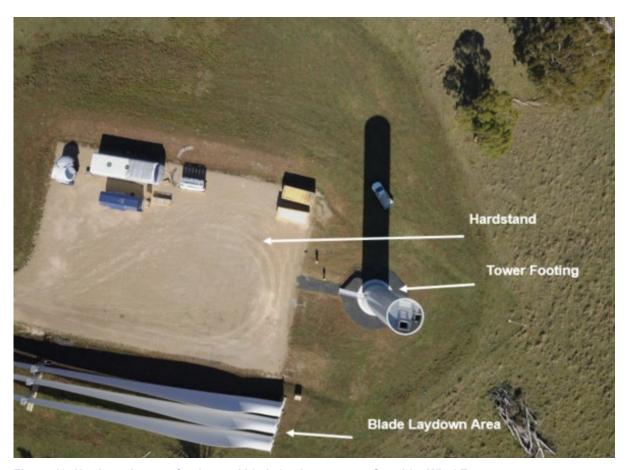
Hardstand, tower footing and blade laydown area at Sapphire Wind Farm
